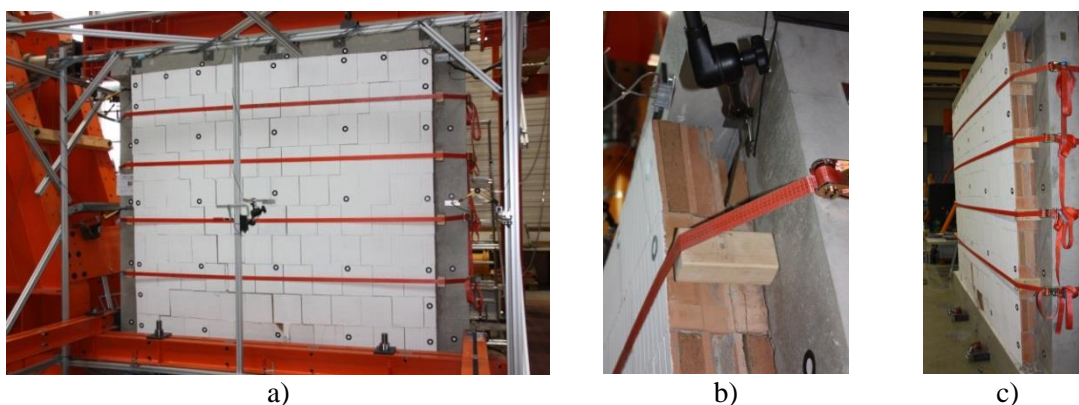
a) Damage of the infill, b) failure of the brick at the top and c) tilting of the infill panel at the end of the Test BO
